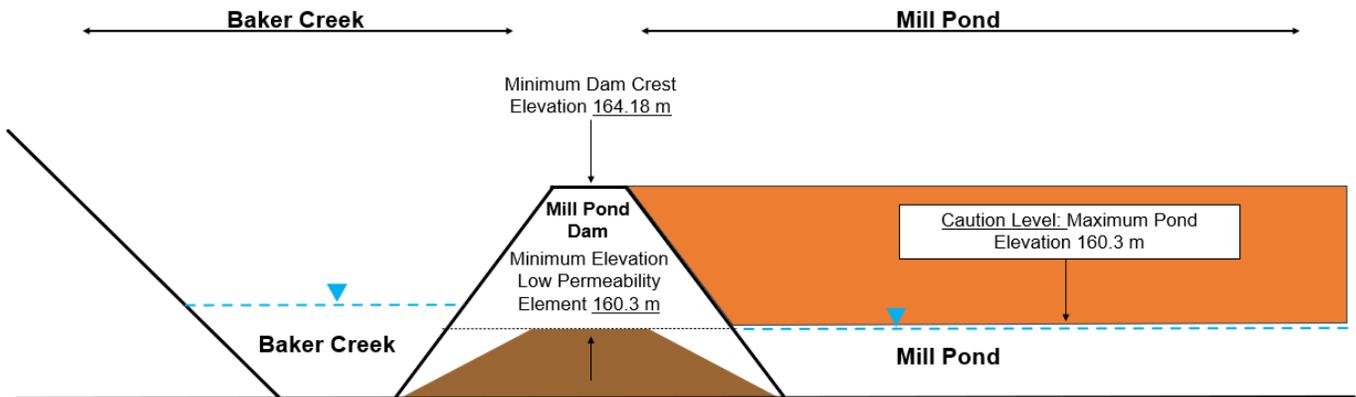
Water and Infrastructure Elevations for Mill Pond Structure and Baker Creek (not to scale)
